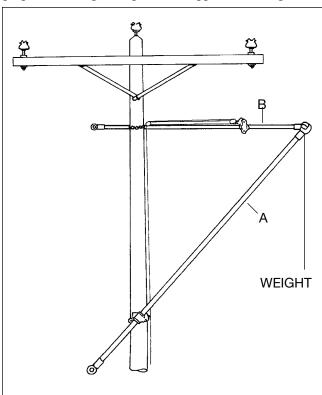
Wire Tongs with saddles and wire tong blocks clamp on holding stick.
